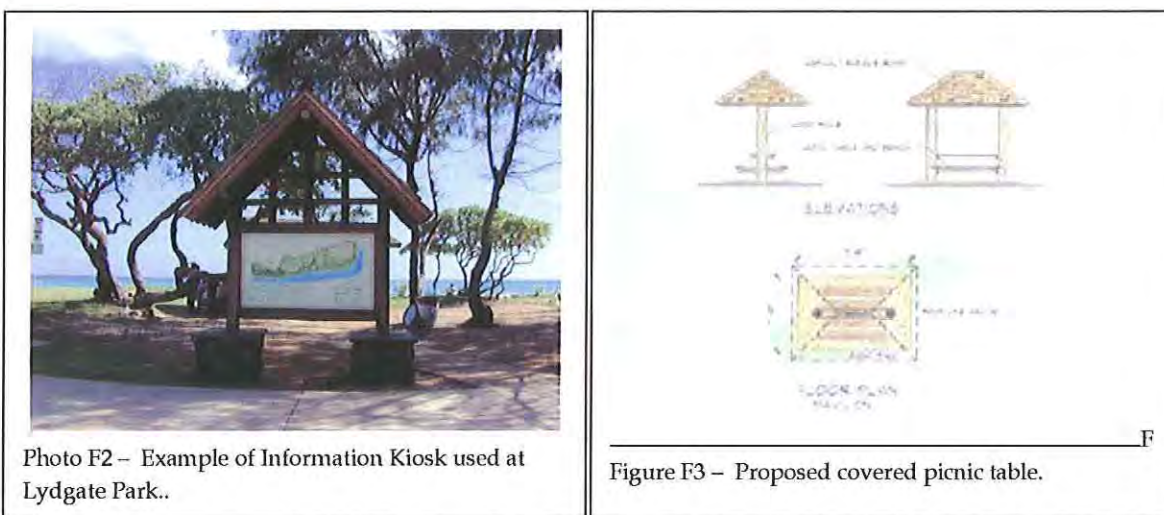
Example of Information Kiosk used at Lydgate Park..
